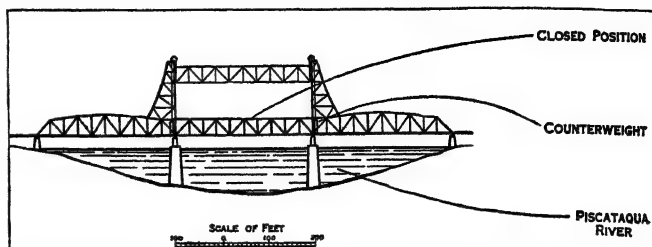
VERTICAL LIFT SPAN, 300 FT. WIDE, PORTSMOUTH BRIDGE, MAINE, U.S.A. WHEN RAISED IT GIVES A CLEARANCE ABOVE WATER OF 150 FEET
